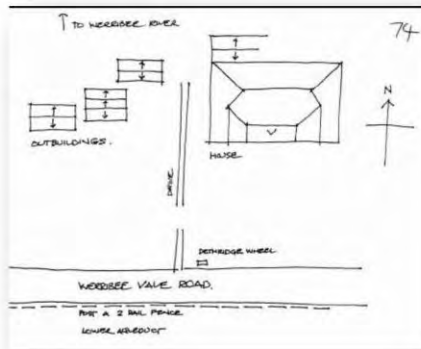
Blinkbonnie Farmhouse and Dethridge Irrigation Wheel, 176 Werribee Vale Road, 1994 sketch plan
